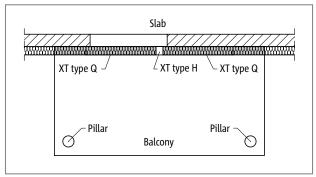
Schöck Isokorb® XT type Q: Balcony with column support
